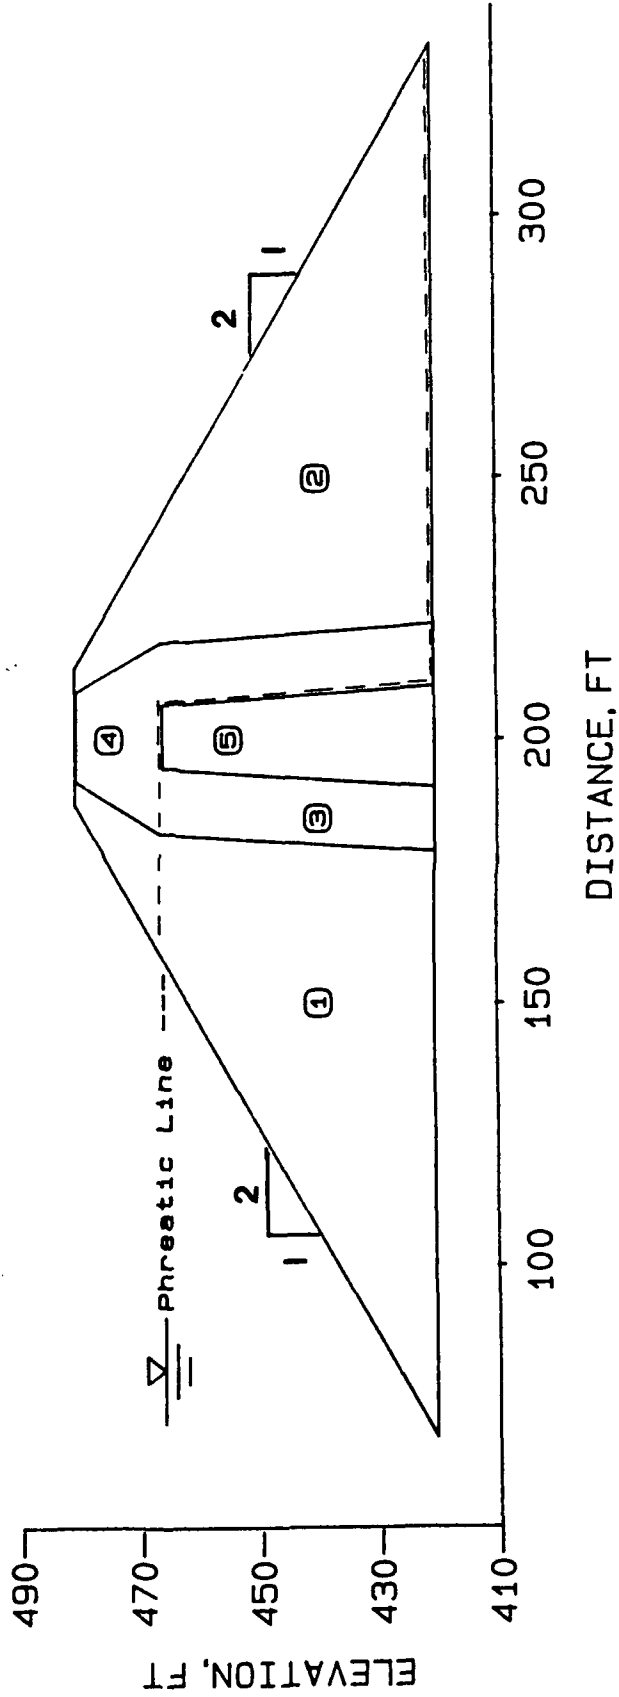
Idealized embankment section of Mormon Island Dam founded on rock and developed from cross section of dam at sta 426+00
